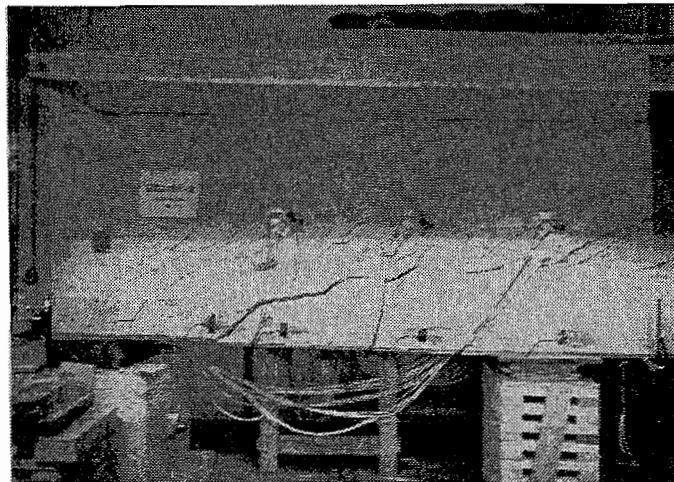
Cracking Pattern at Horizontal Shear Failure, DZ2450-2
